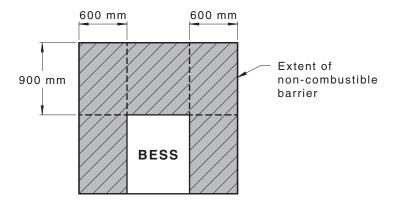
Barrier zones for pre-assembled integrated BESS installed on or near a habitable room facing wall
